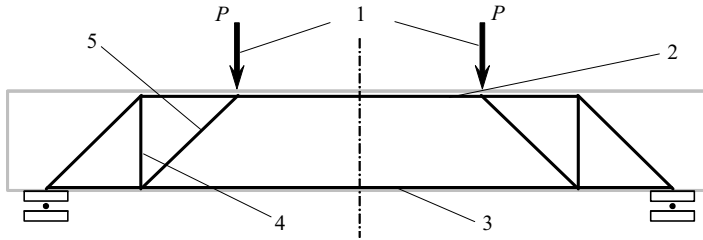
Truss model for reinforced concrete: 1 — load; 2 — compression chord; 3 — tension chord; 4 — tension tie; 5 — compression strut.
